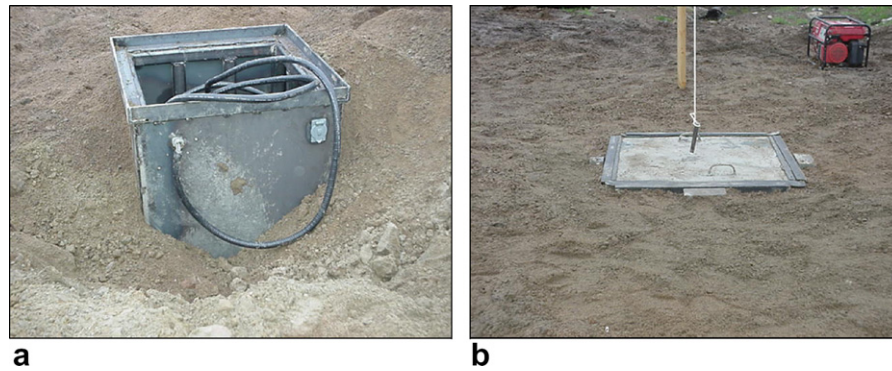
Preparation steps of the final blast test set-up: (a) Partially buried box supporting the blast panels; (b) typical test panel placed on top of the buried box.
